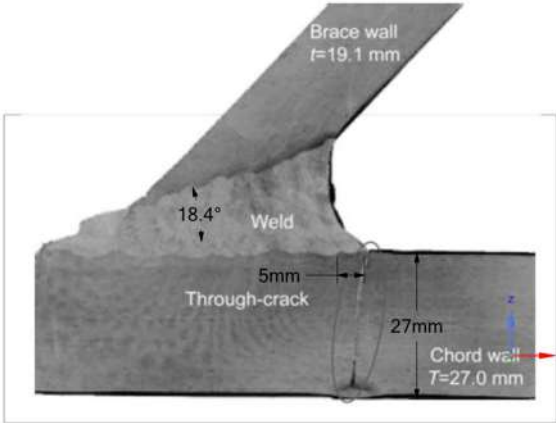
Jo et al. crown heel through-thickness crack, with joint dimensions sketched
